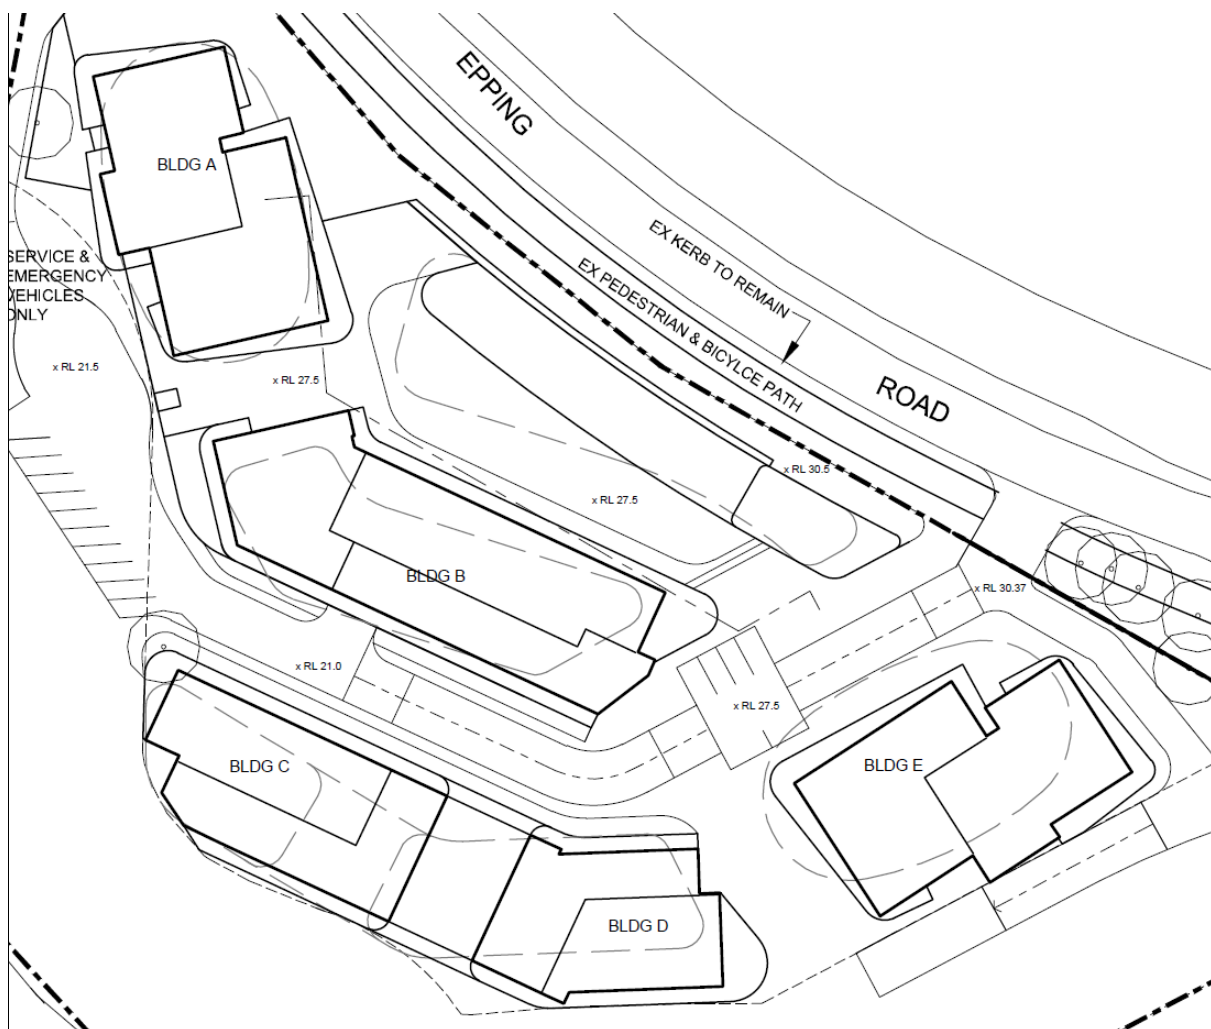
Proposed building footprints (source CM+ proposed plans)
